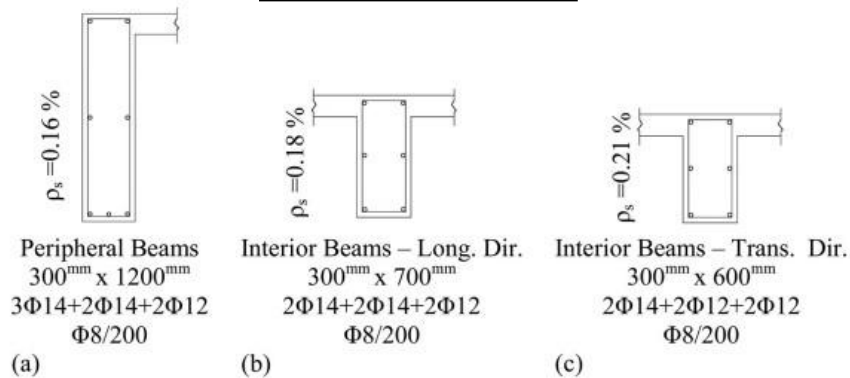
Cross-sectional dimensions, longitudinal and transverse reinforcement of the (a) peripheral beams, (b) interior beams in the longitudinal direction and (c) interior beams in the transverse direction of the building.
